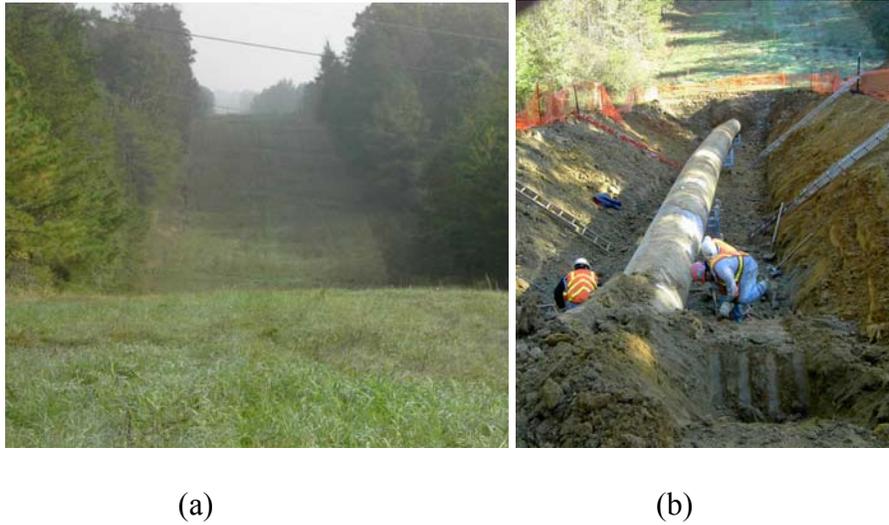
Site #1 (a) before excavation, and (b) after excavation
